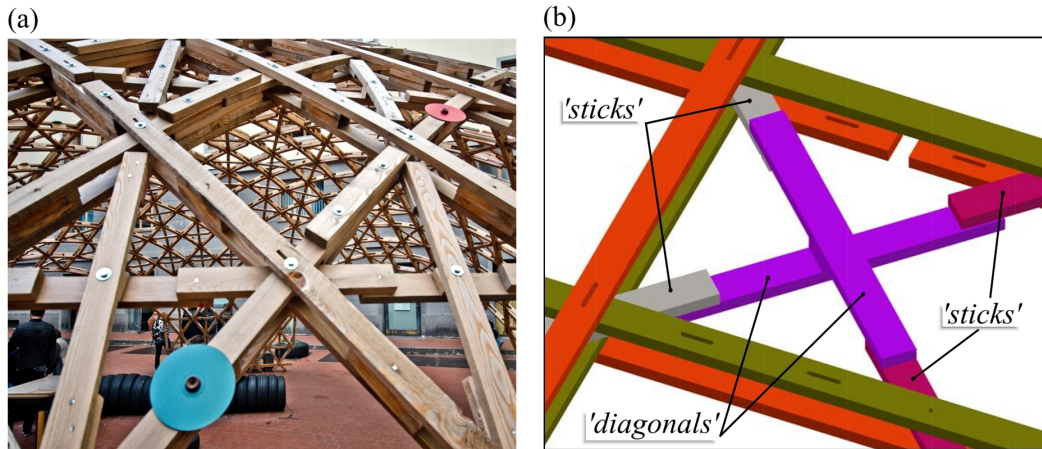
Toledo gridshell 2.0. Bracing system: (a) Construction detail; (b) Detail of the joint between sticks and diagonals.
